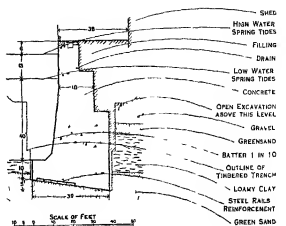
SOUTHAMPTON ENG. OCEAN DOCK SECTION OF QUAY WALL BUILT IN THE DRY IN TIMBERED TRENCH
